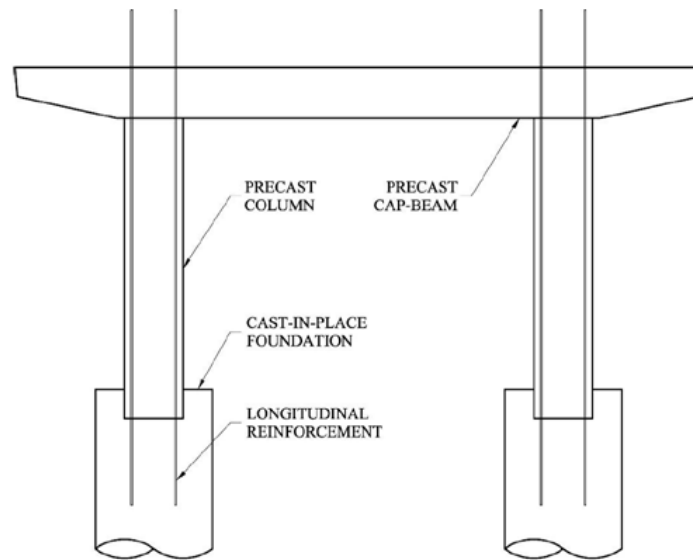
Proposed precast bridge bent system (Hieber et al. 2005b)
